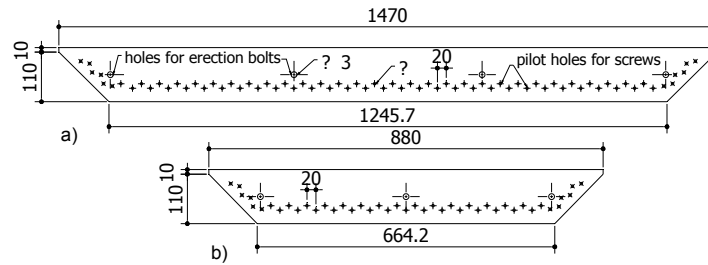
Details of fish plates connected to: (a) beams; and (b) columns (Dimensions in mm)
